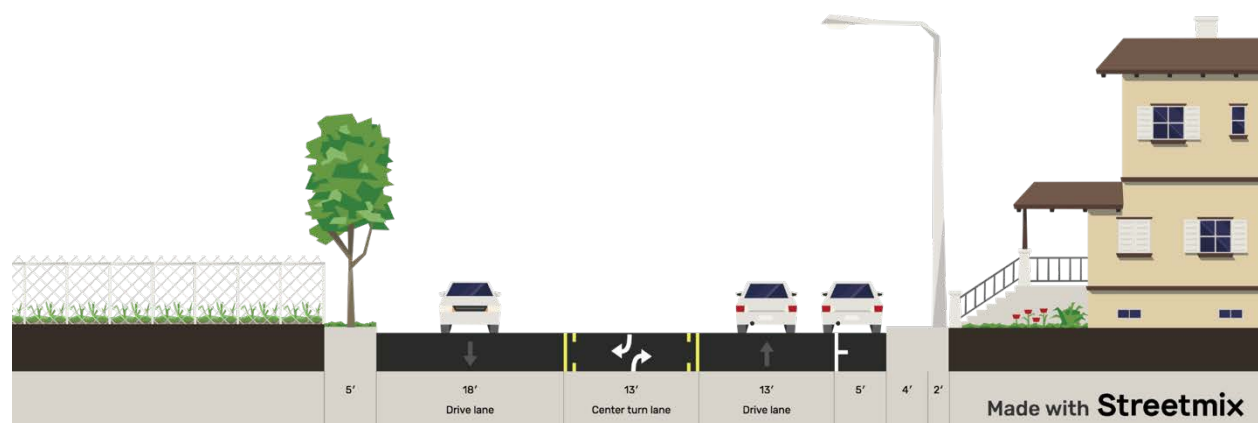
The street cross-section for West Gwinnett Street, looking east from the combined Collat Avenue/Carroll Street intersection. The street has two travel lanes, and a shared center turn lane. Parked cars were only observed on the south side of the street, although there are no paint markings to delineate this as a parking zone. Diagram created in Streetmix by EC, 2022.
